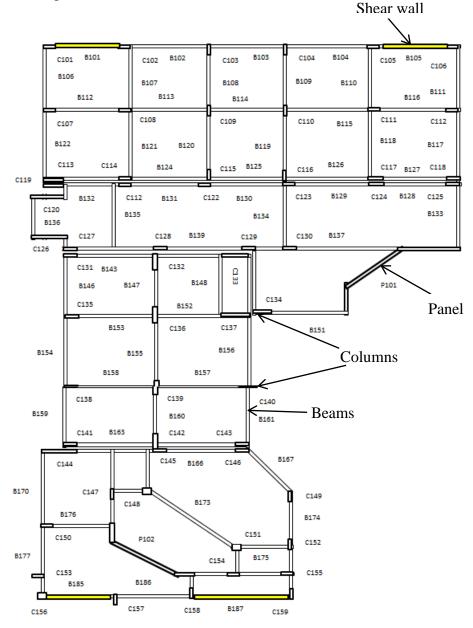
Shear wall placement in the plan of the building for Case study I
